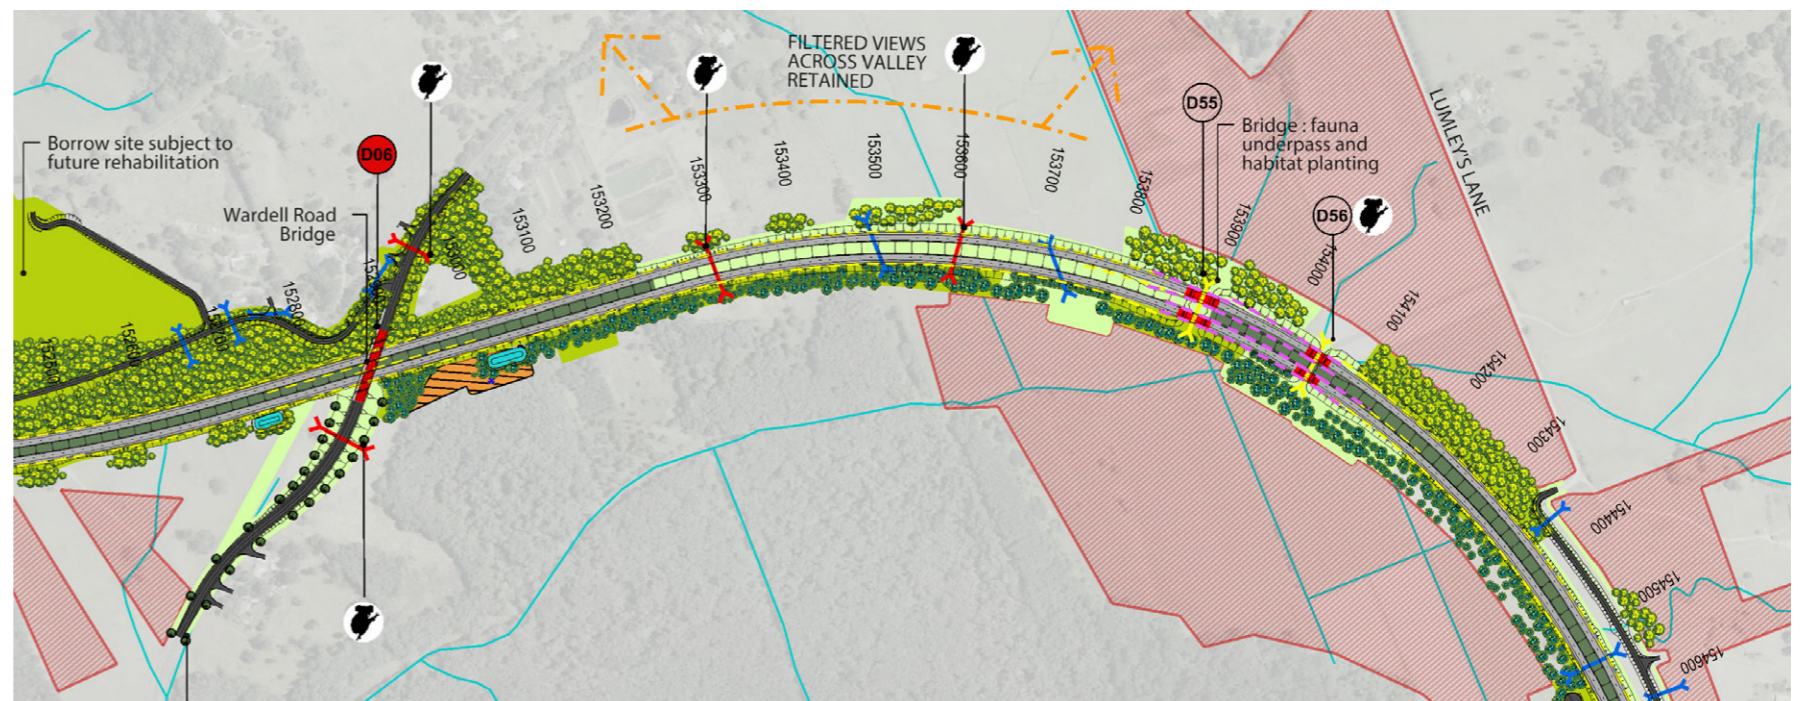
Typical landscape plan within Richmond River to Coolgardie Road - Section 10 indicating vegetation strategy and areas of koala management tree plantation
